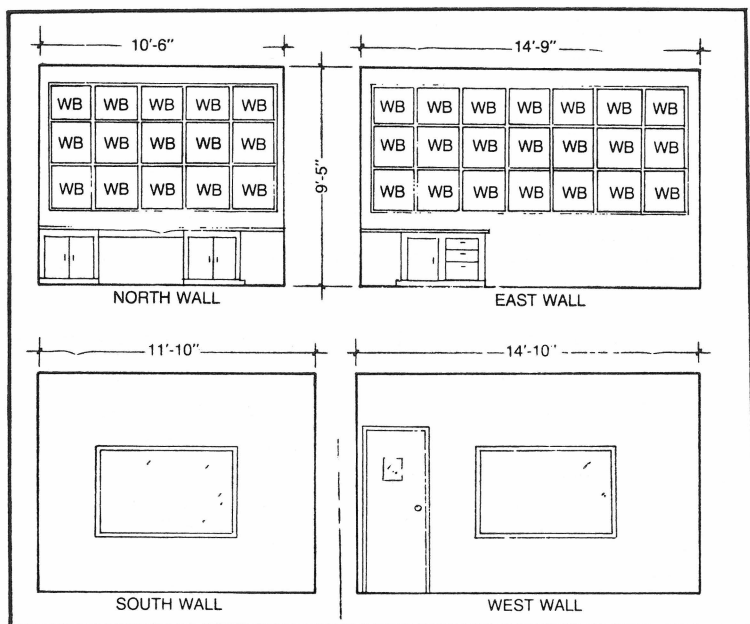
Wall elevations of control room showing locations of wideband (WB) modules on north and east walls.
